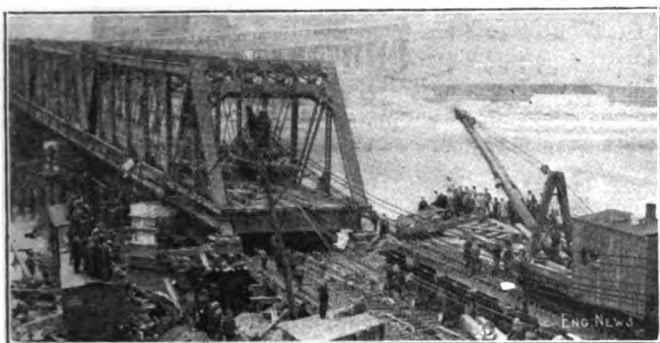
HAULING THE MISSOURI PACIFIC RY. BRIDGE SPANS A DISTANCE OF 123 FT. ON FALSEWORK TO ITS POSITION ON THE NEW PIERS
